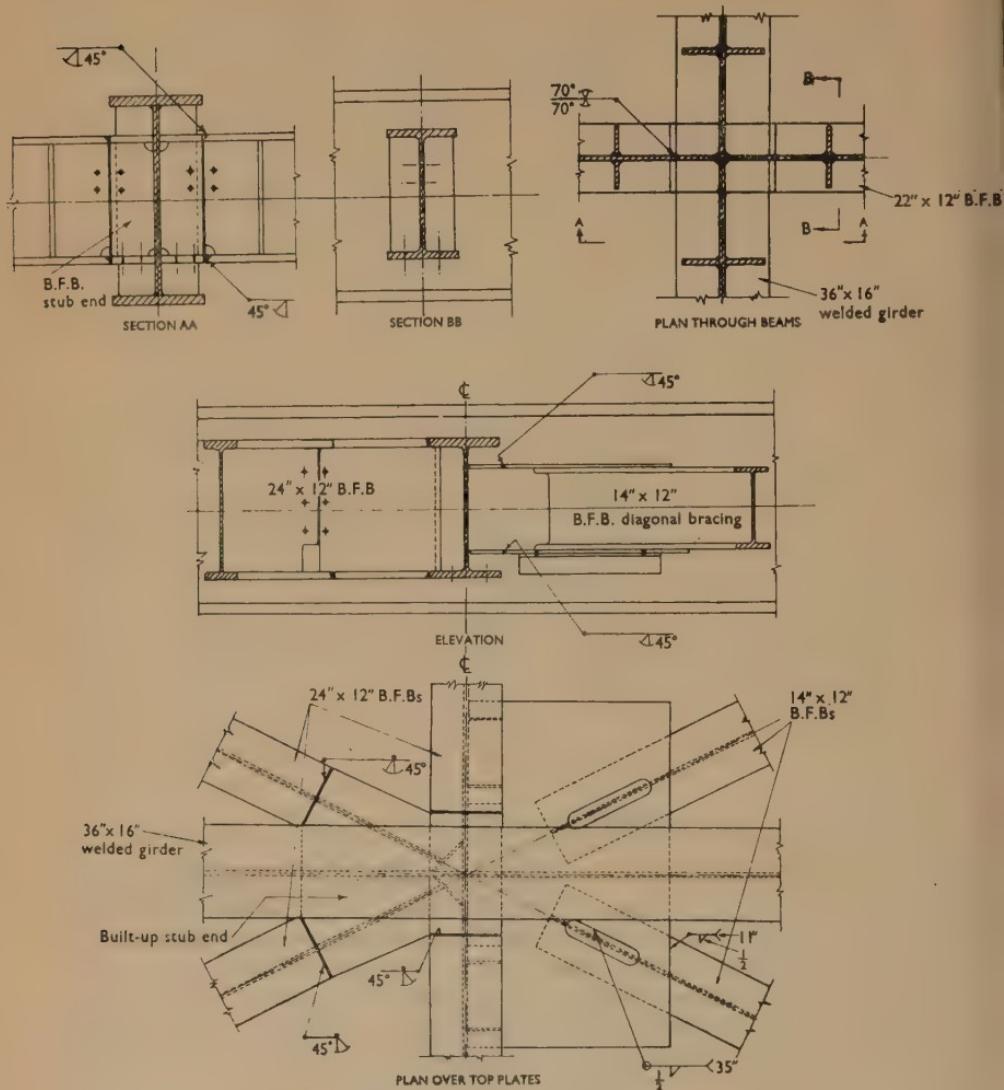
TYPICAL WELDED JOINTS
